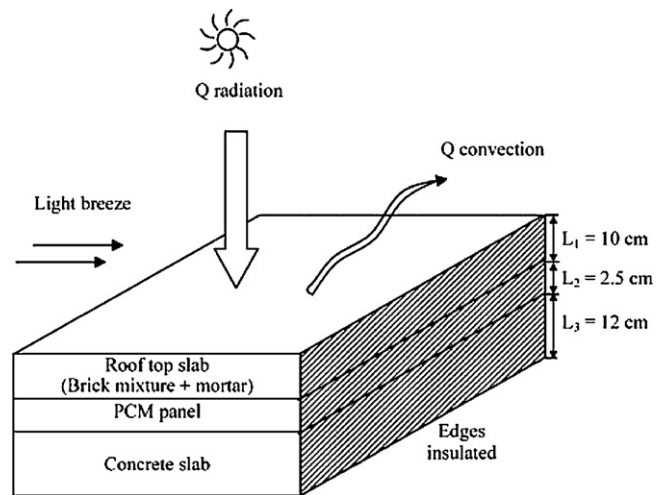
Sketch of building roof integrated with PCM panel [79].
